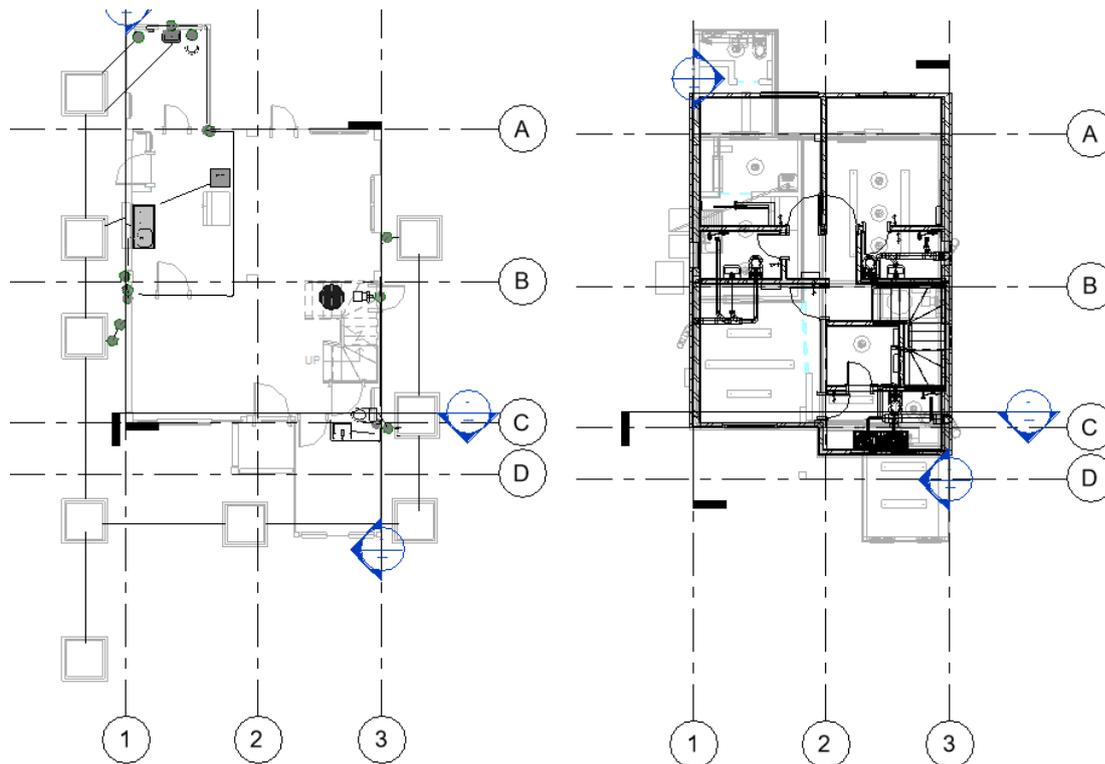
Ground and first floor view of the plumbing and sanitary design of the case study house
